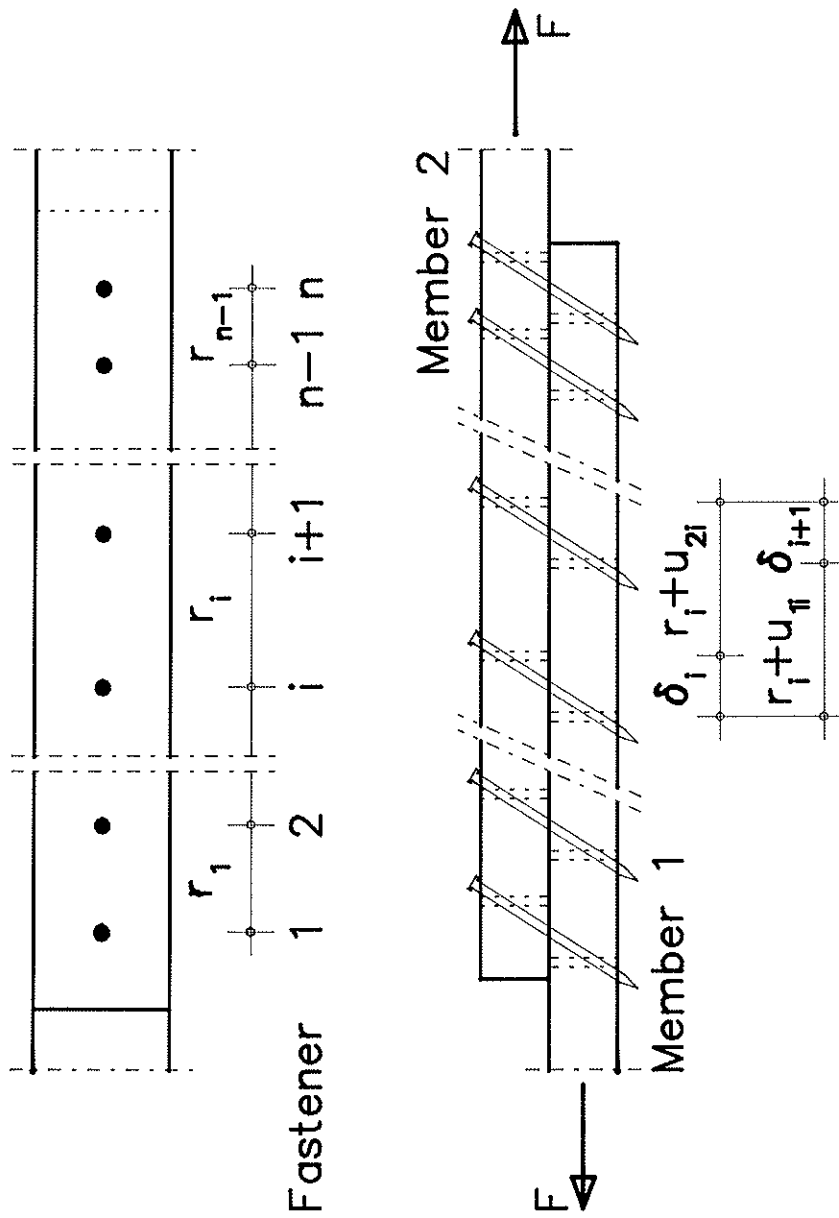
View of undeformed connection (top) and section showing deformed position (bottom).
